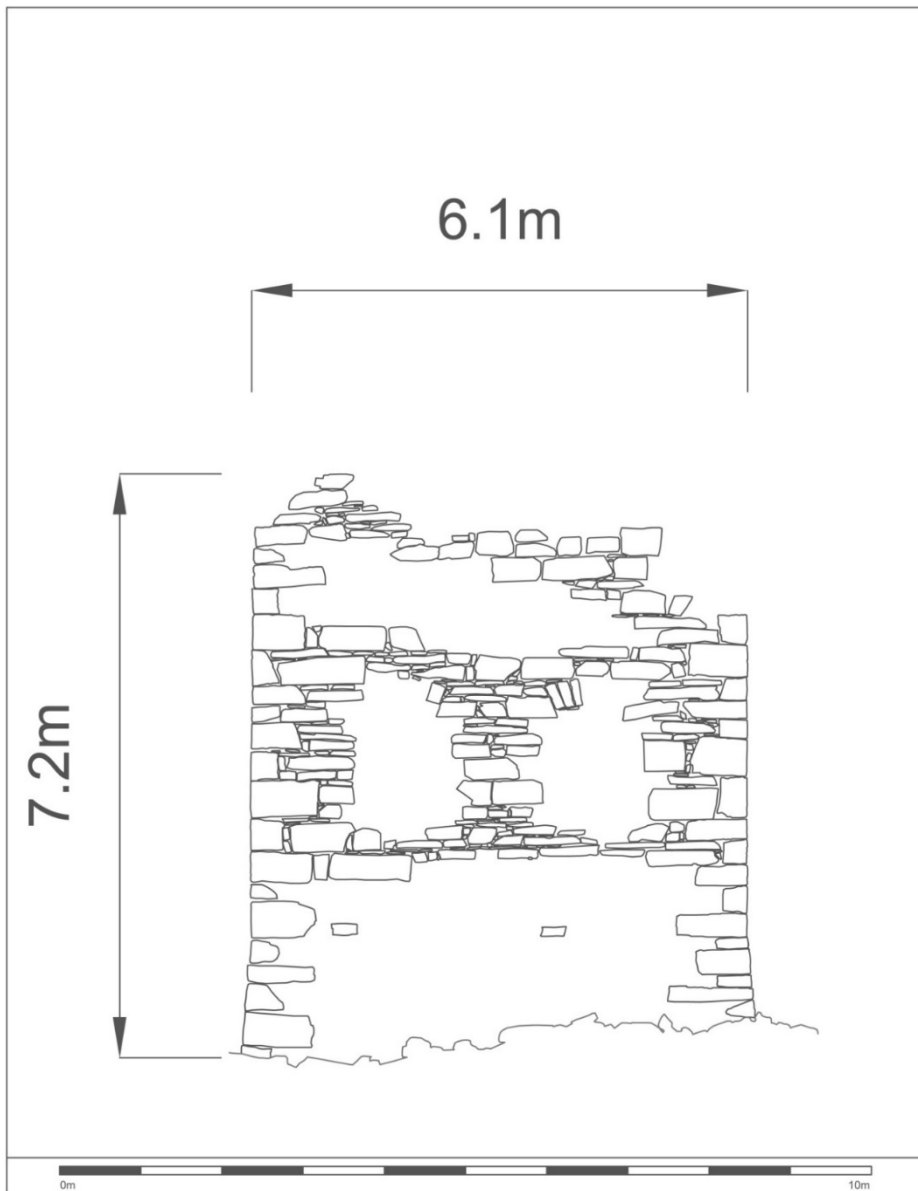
External elevation of the south wall of Clare Island Signal Tower.
